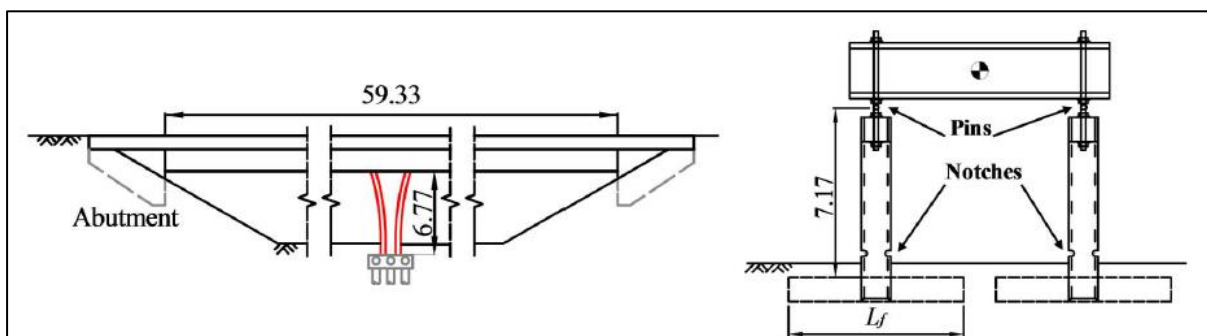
(a) A longitudinal view of the prototype bridge for LJD02 test series; (b) an elevation view of the bridge model in transverse direction (note: $L_f = 5:04$ m for rocking bridge and $L_f = 7:56$ m for hinging-column bridge). (*Deng et al., 2012*)
